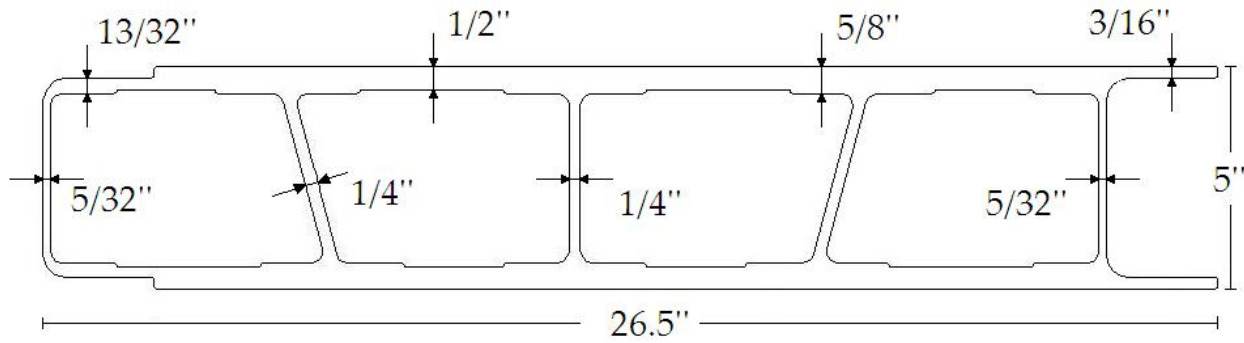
Cross Section of a Multi-tube DuraSpan™ 500 Test Bridge Deck Panel
